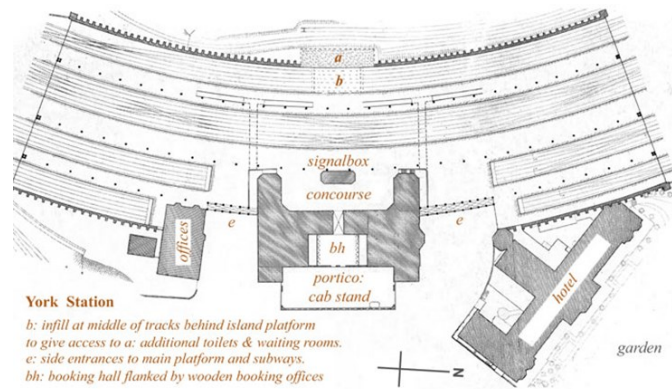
The U-shaped plan of the station booking building located in between offices and the station’s hotel.
